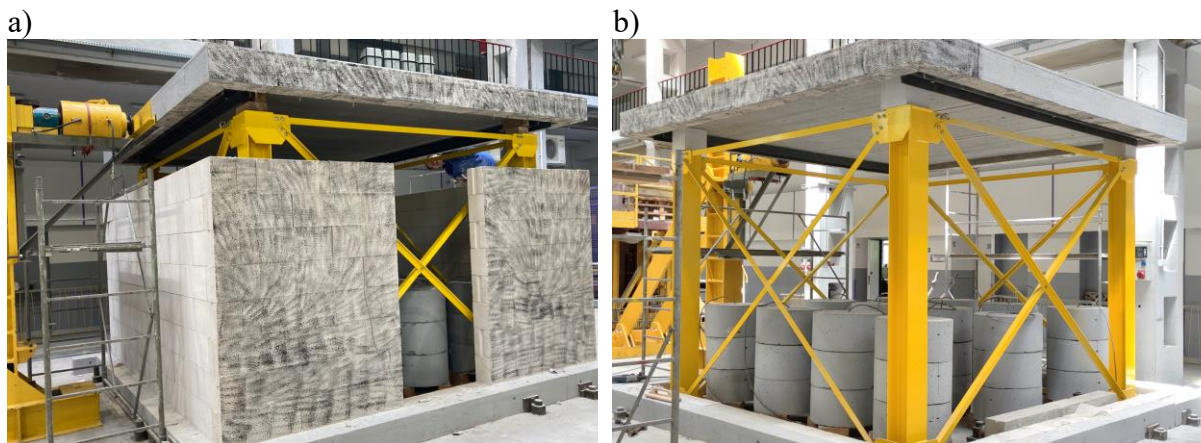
Procedure of reusing the slab: a) demolition of masonry walls after the test, b) slab left on supporting steel structure
